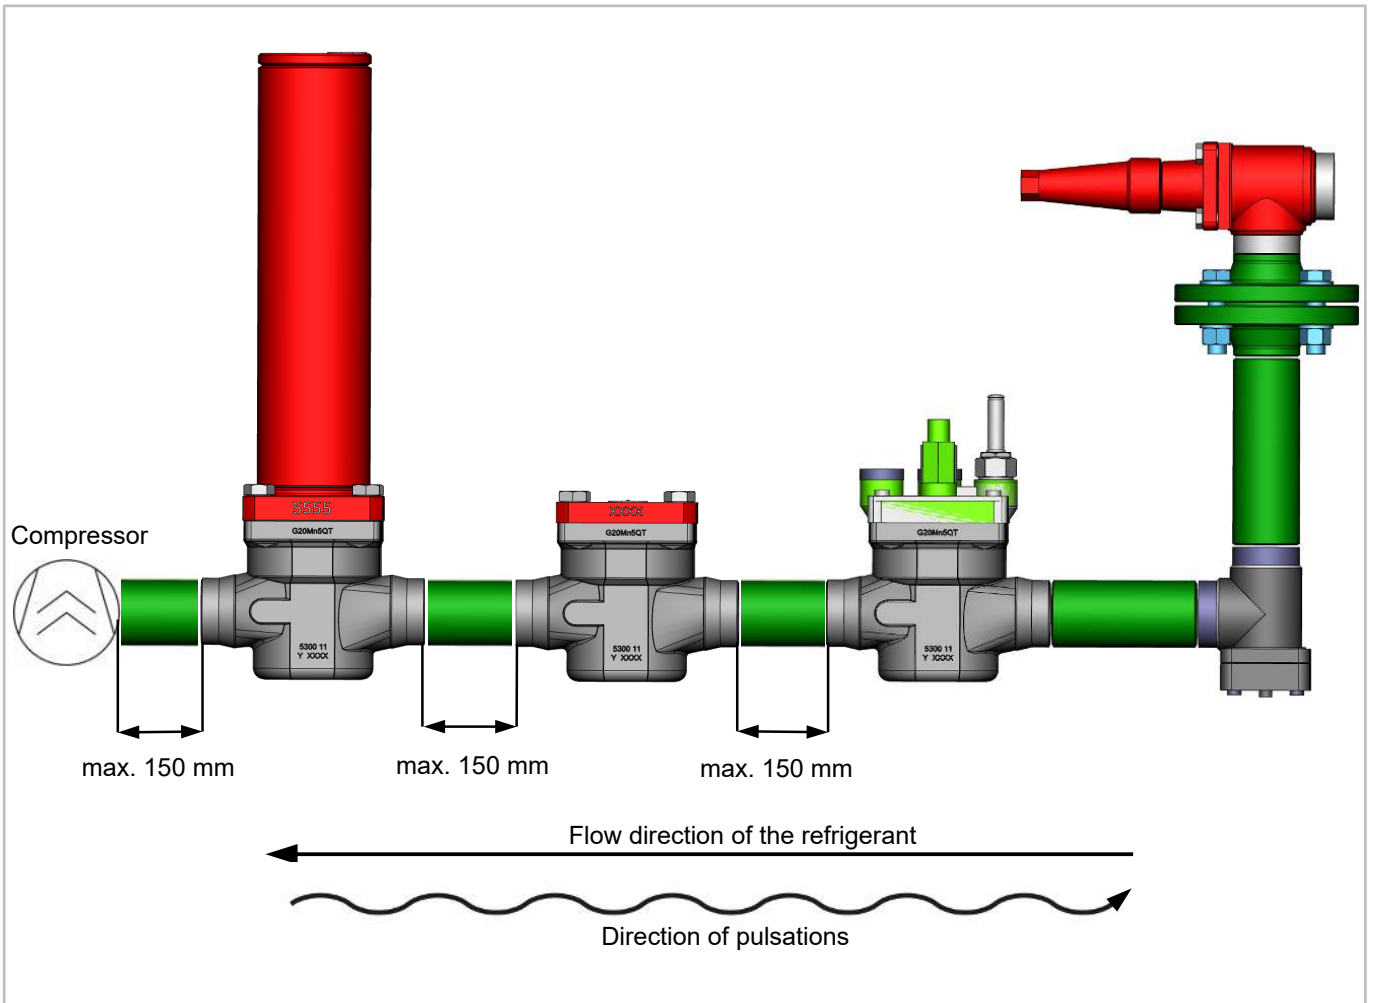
Muffer system, consisting of muffer, check valve, control valve
